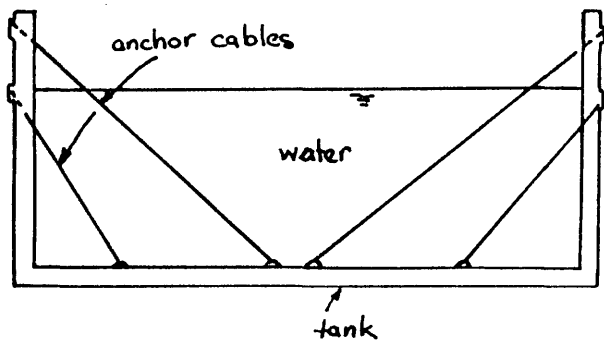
ANCHOR CABLES FOR WATER RETAINING TANK.
